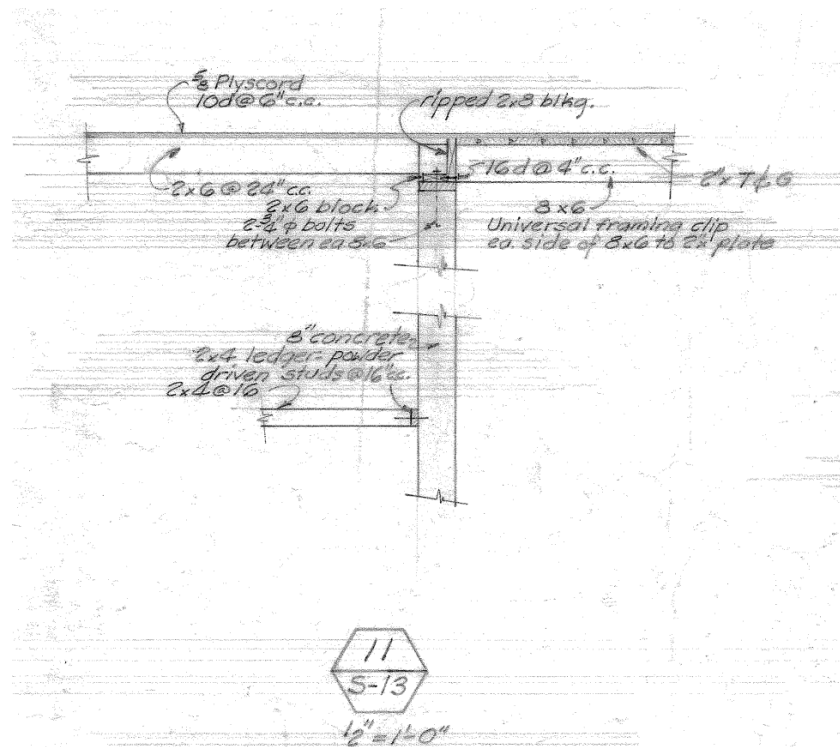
Second Floor Diaphragm to Concrete Wall Detail 11/S13
